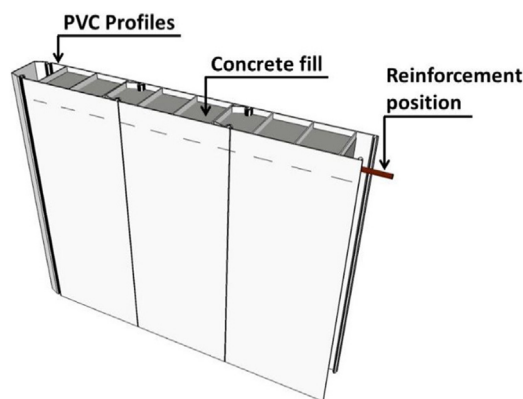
Illustration of the cross-section of the panels and the reinforcement position.
